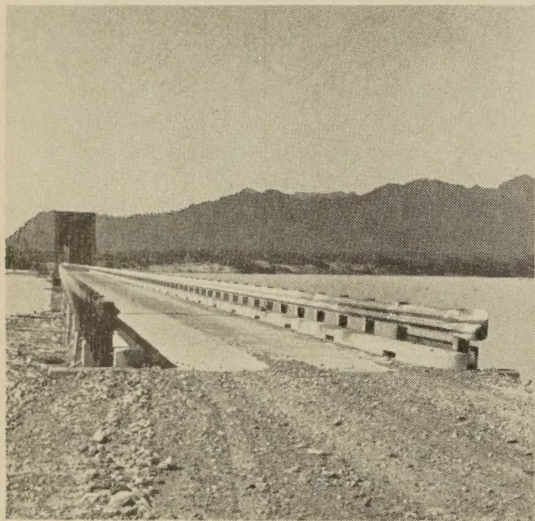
Paint erosion on guardrail of east abutment of Mile 27 Bridge.
